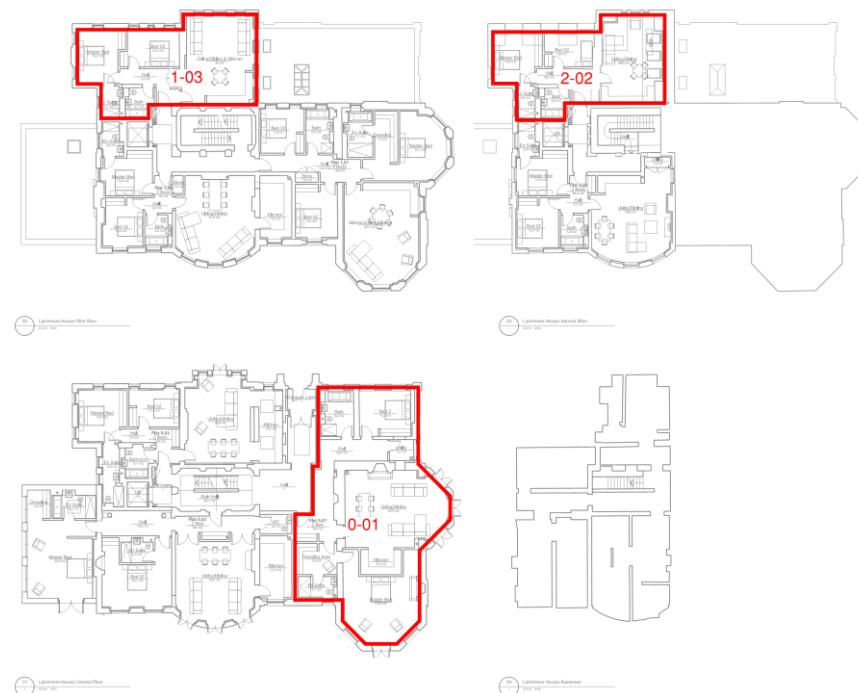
Tested proposed refurbished dwellings within Latchmere House
